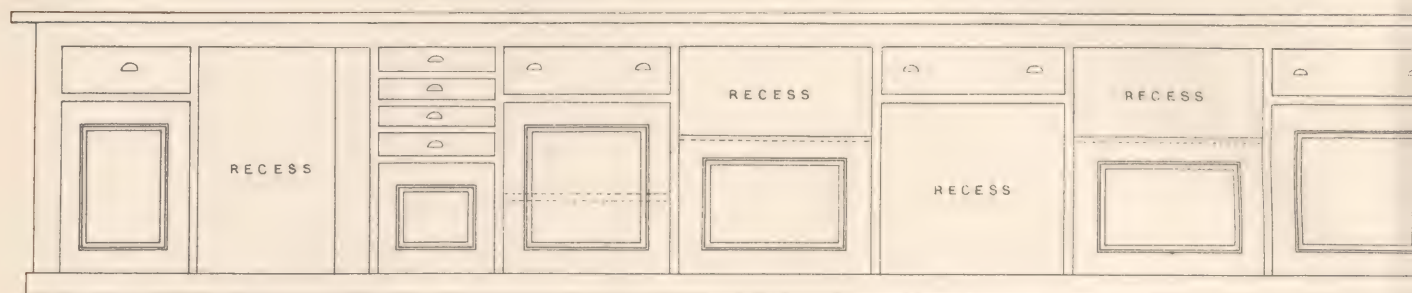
BACK ELEVATION. PITCH PINE FRONTS.
